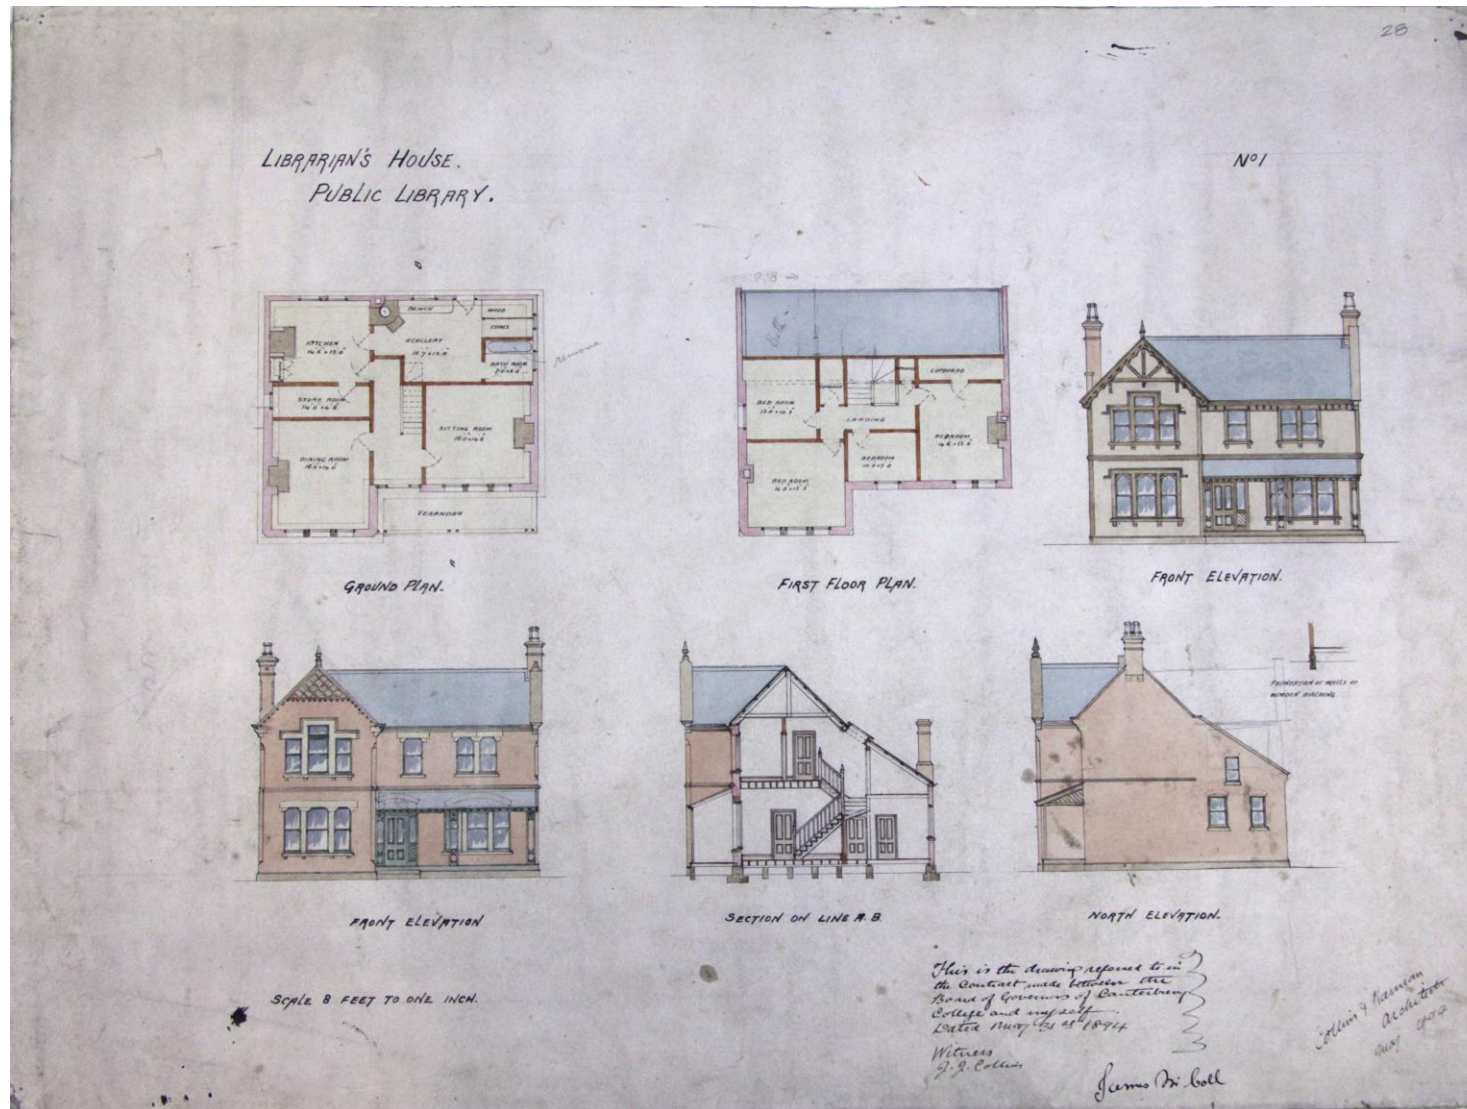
Collins and Harman, Librarian's House, Public Library, plans, elevations and section (1893).
